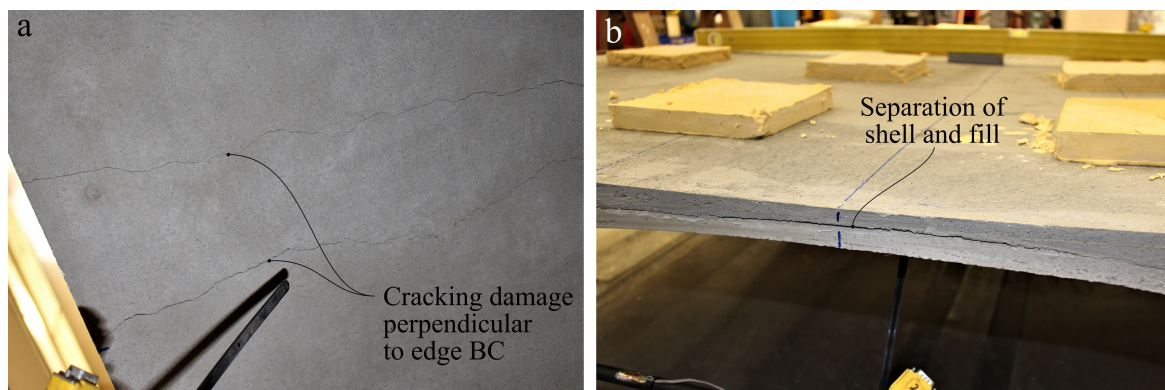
Damage to Shell 3 caused by accidental slip of the corner supports after formwork removal. Image a) shows cracking on the underside of the shell and image b) shows separation of the foam and TRC.
